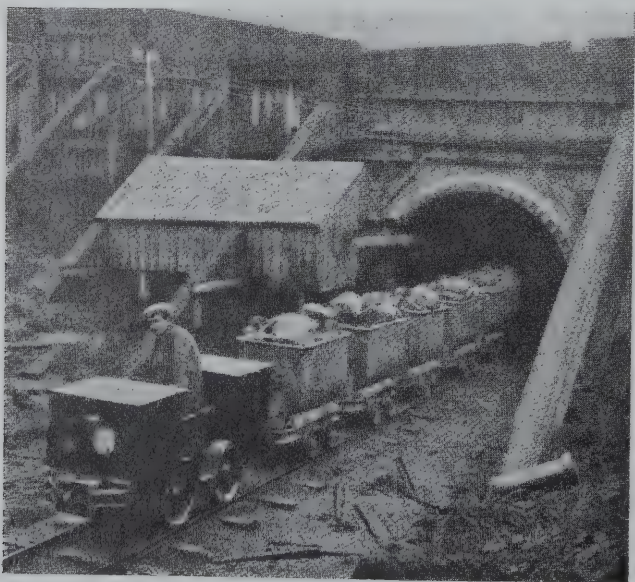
P.F.V. LOCO. HAULING TRAIN OF TRUCKS OUT OF EXCAVATION FOR SEWER.
